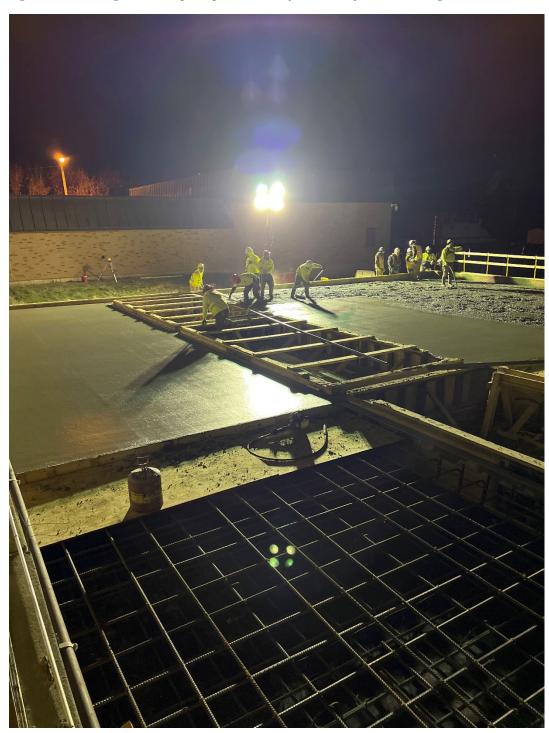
Outfall Structure wall pour (N-s) + divider wall steel (E-W)
